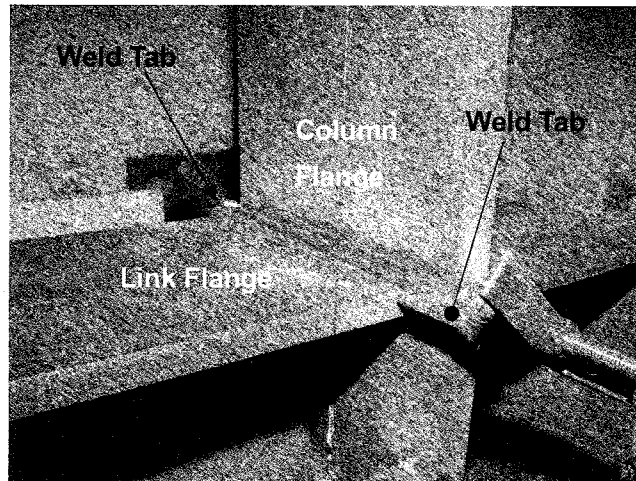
Flange weld and weld run-off tabs for Specimen 4.
